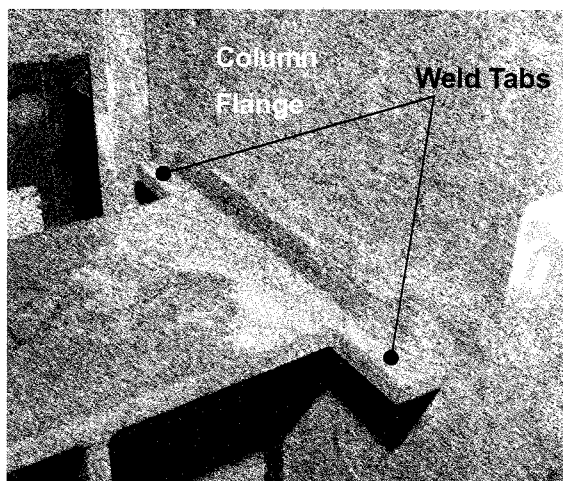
Specimens 1 to 3: typical link flange fillet weld.
